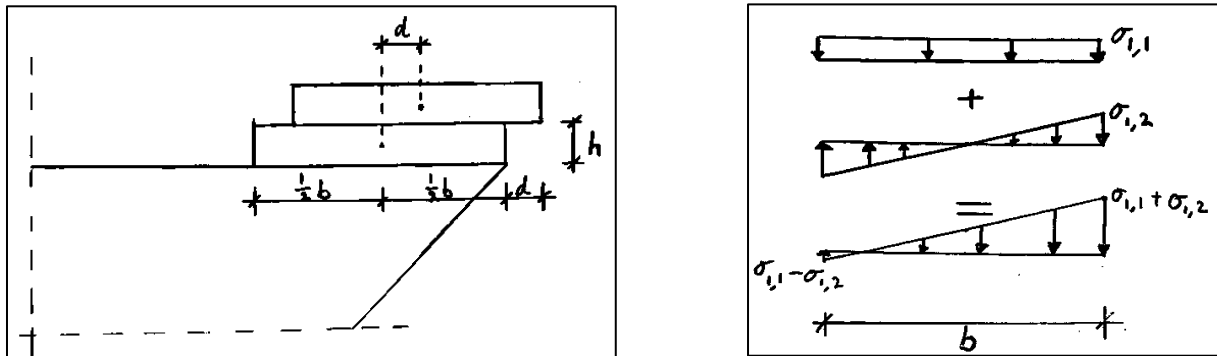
First printed layers of concrete at the prefab element (left) and stresses in lowest printed layer due to a layer on top.
